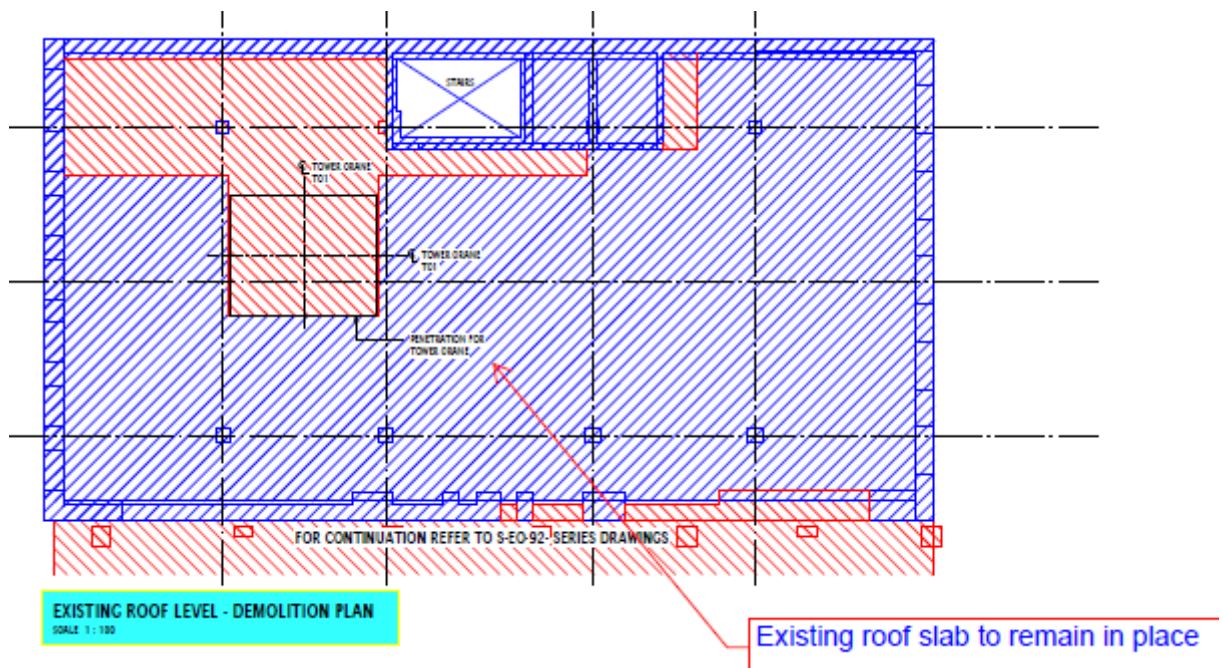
Existing roof level—demolition plan. (Source: RBG, drawing number S-285-92-07-00)
